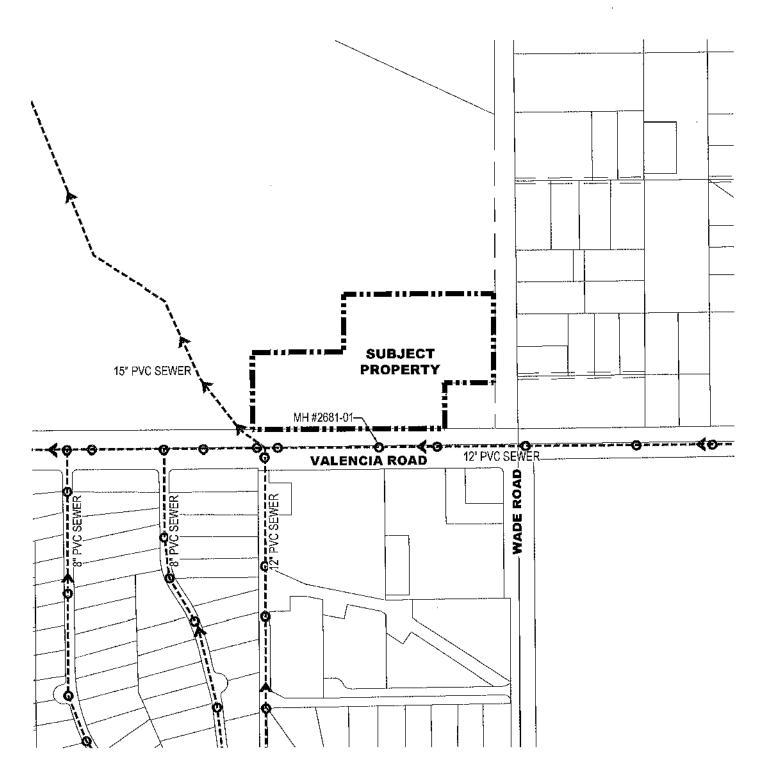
EXISTING PUBLIC SEWER SYSTEM
